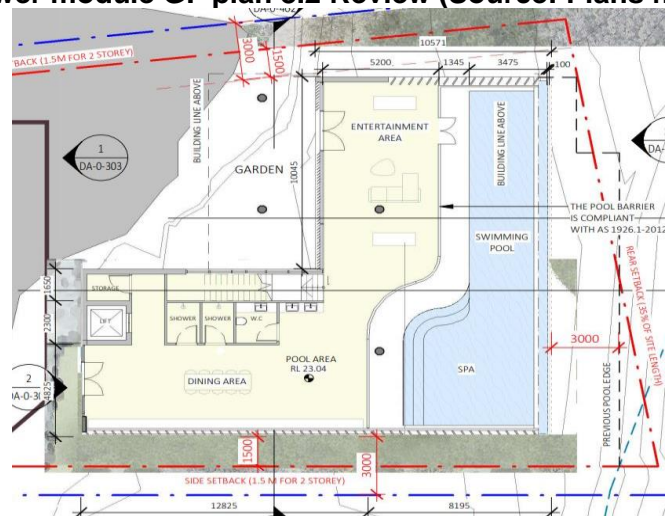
Amended lower module GF Plan (Source: Plans from applicant)
